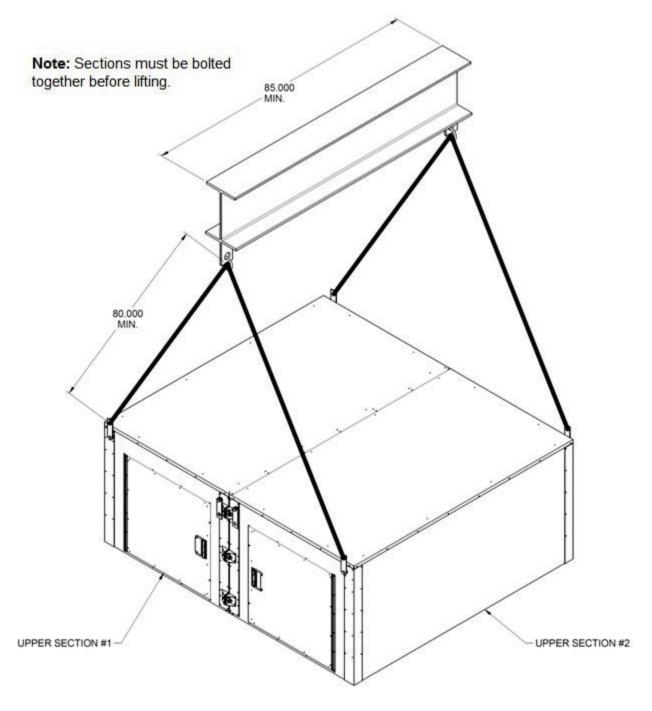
Two Piece Dual Unit Fan Section Lifting Details
